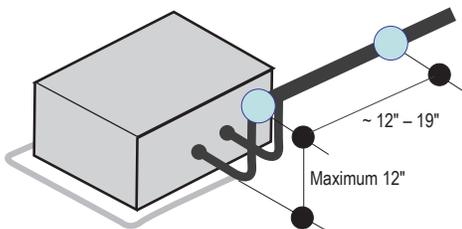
Typical Pipe Support Location—Change in Pipe Direction.
